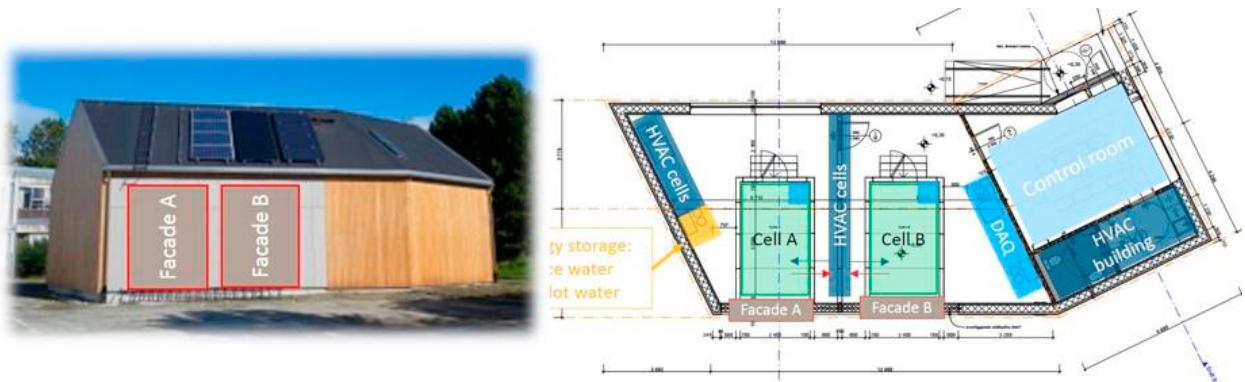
ZEB Test Cell Laboratory. (a) View from south. (b) Plan of the building
